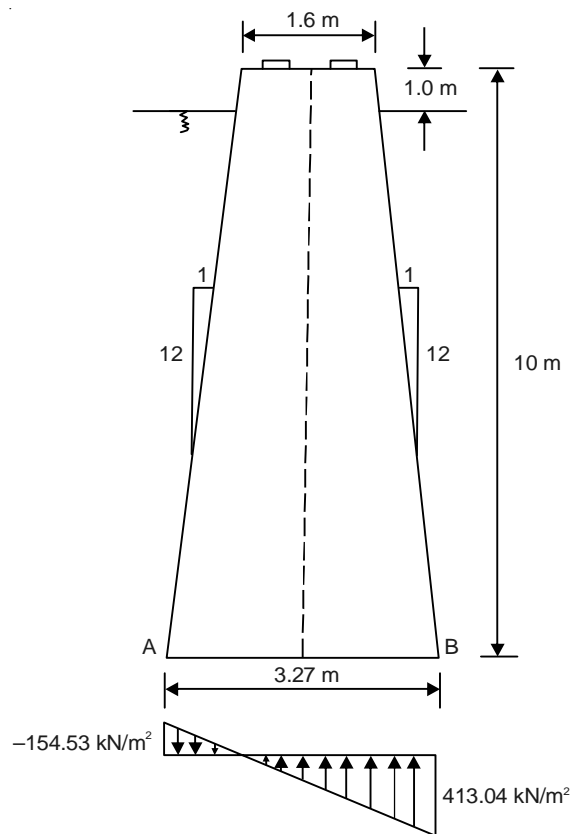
Section of the pier and pressures at the base (Example 12.2).
